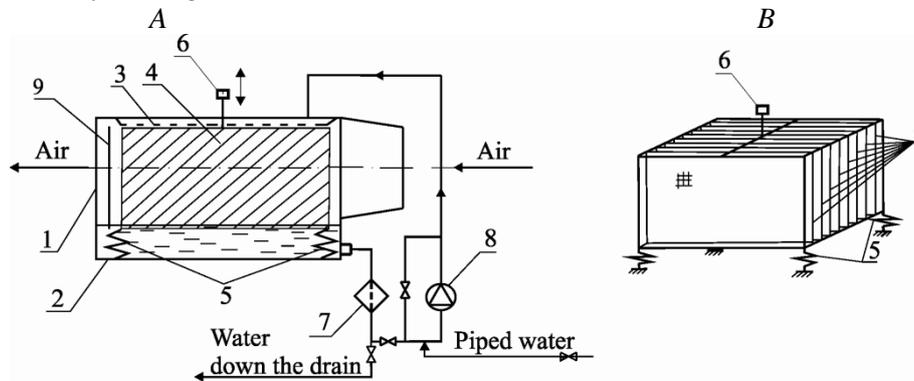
Contact apparatus with vibrated plate packing *A* – diagram; *B* – contact assembly with plate packing 1 – casing; 2 – lower tray; 3 – upper perforated tray; 4 – plate packing unit; 5 – spring shock absorber; 6 – mechanical vibrator; 7 – water filter; 8 – pump; 9 – drop catcher
